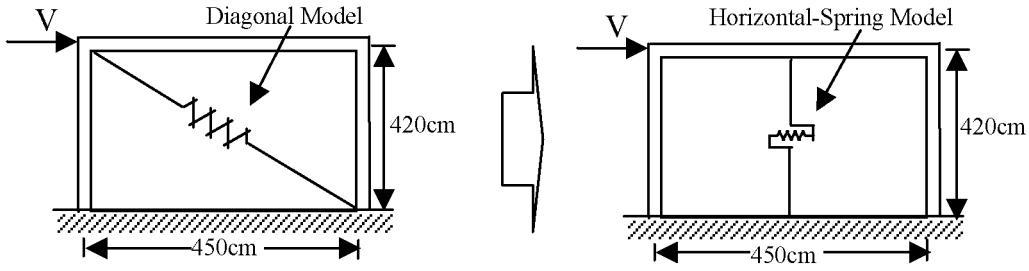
Diagonal-spring and horizontal-spring as two masonry infill wall models.
